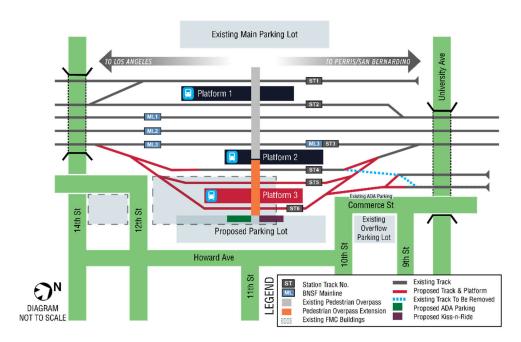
Build Alternative with Pedestrian Overpass Access Design Option 1
